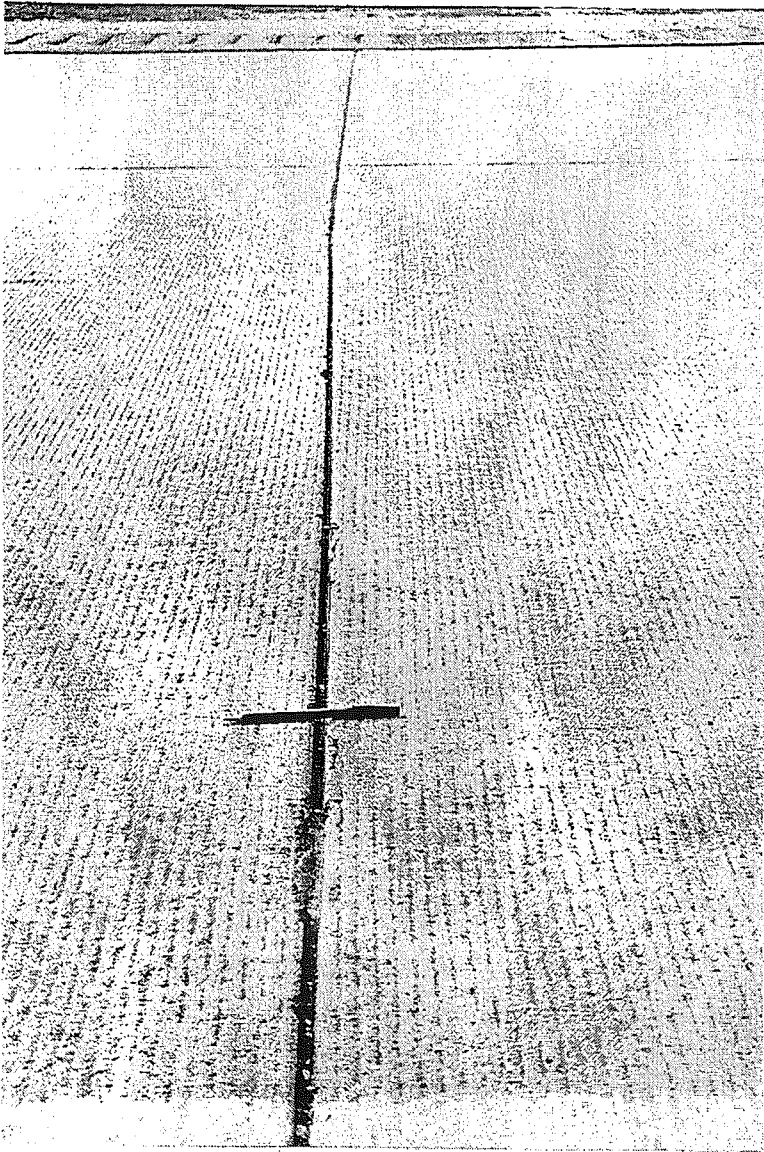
A typical contraction joint on CSN# 11017-32516A (Section D) WB, showing some spalling along the joint.
